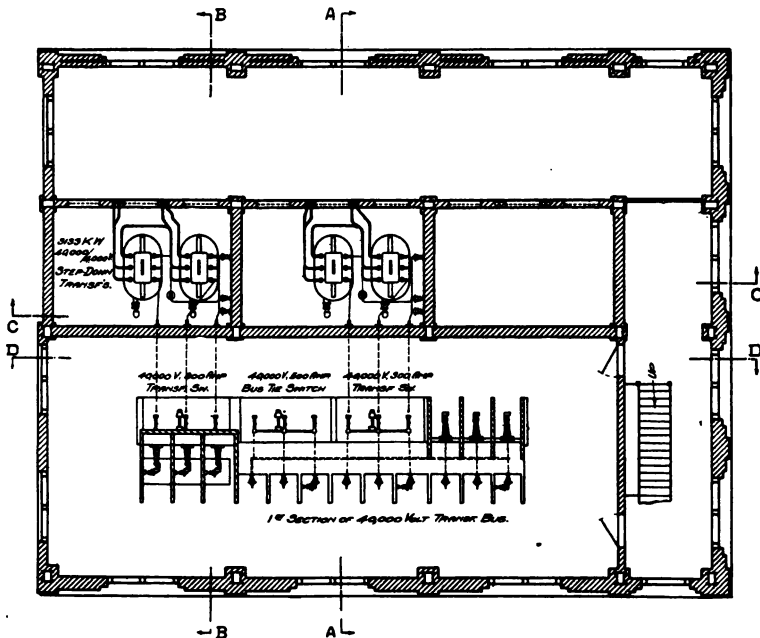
Second Floor Plan, Substation, Chattanooga & Tennessee River Power Co.
